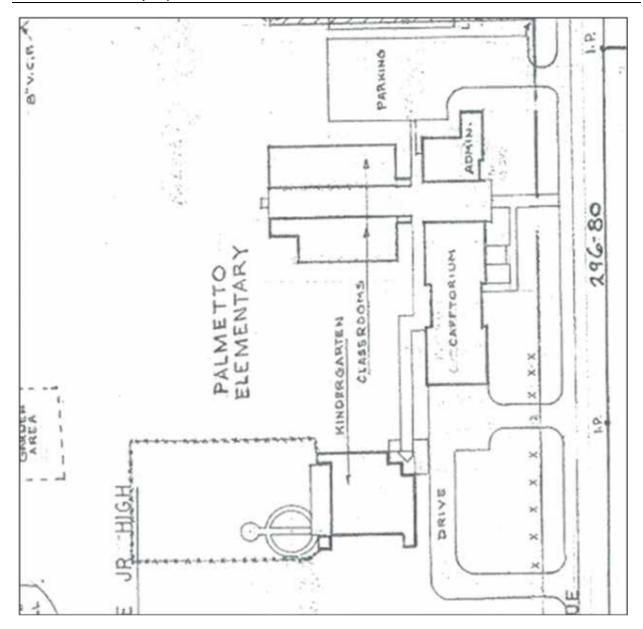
Detail from 1964 Site Plan for Palmetto Elementary School and Clearwater Comprehensive Junior High School, updated to 1977; north is at the top of the image (Pinellas County Board of Public Instruction 1964)
